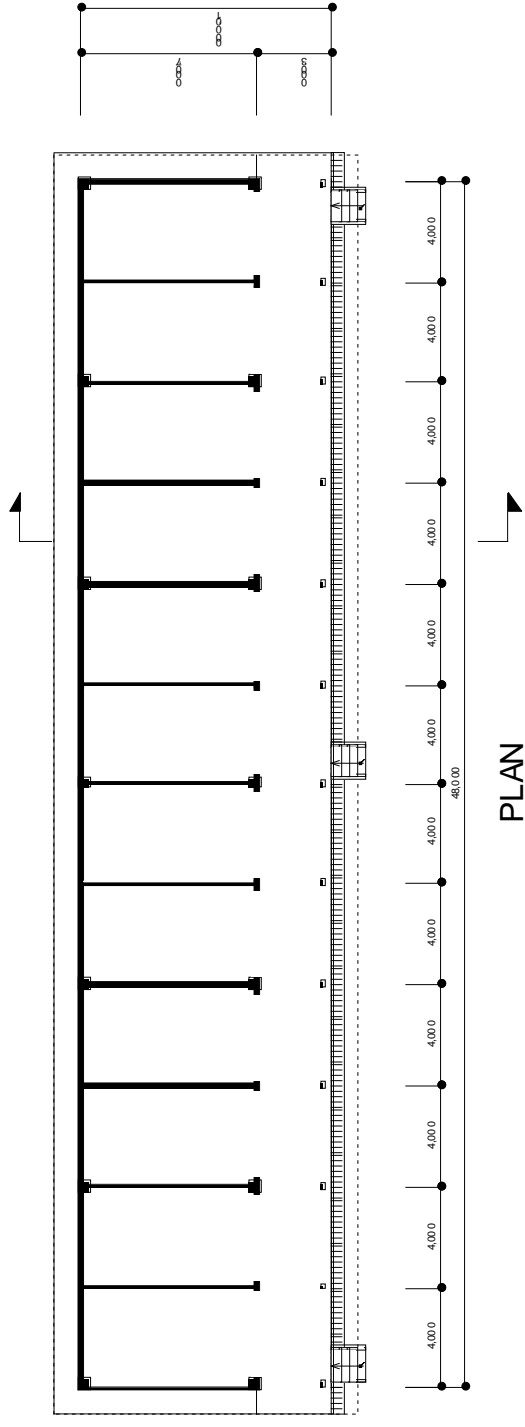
Layout Plan of NWM in Site 1, Biratnagar
